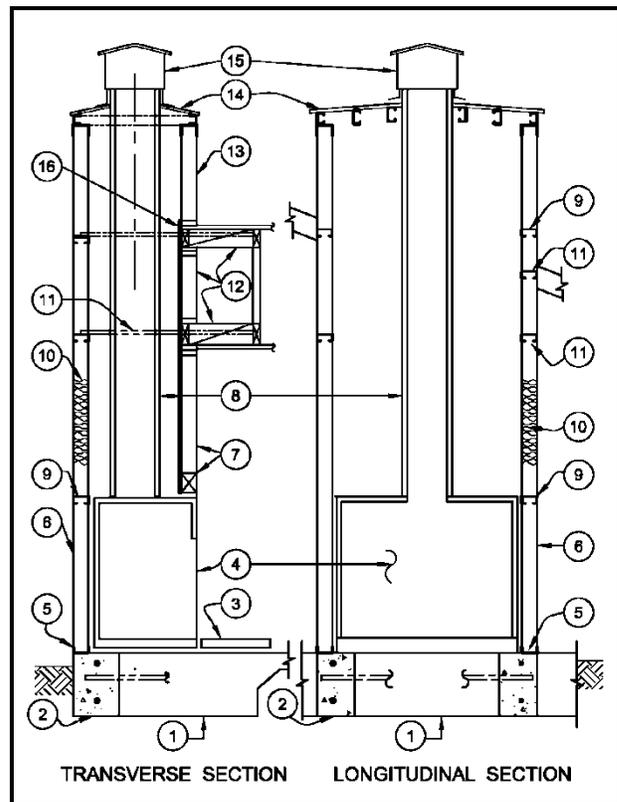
Components of a factory-built fireplace in light-frame chimney chase (Alternative D).
